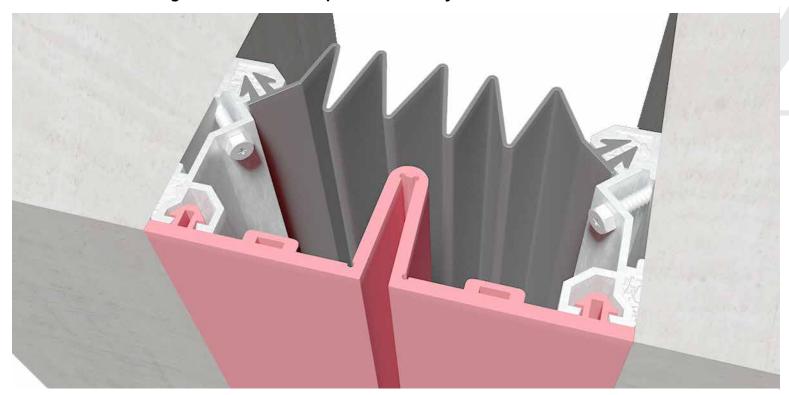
EV Series Expansion Joint System on an Exterior Wall
